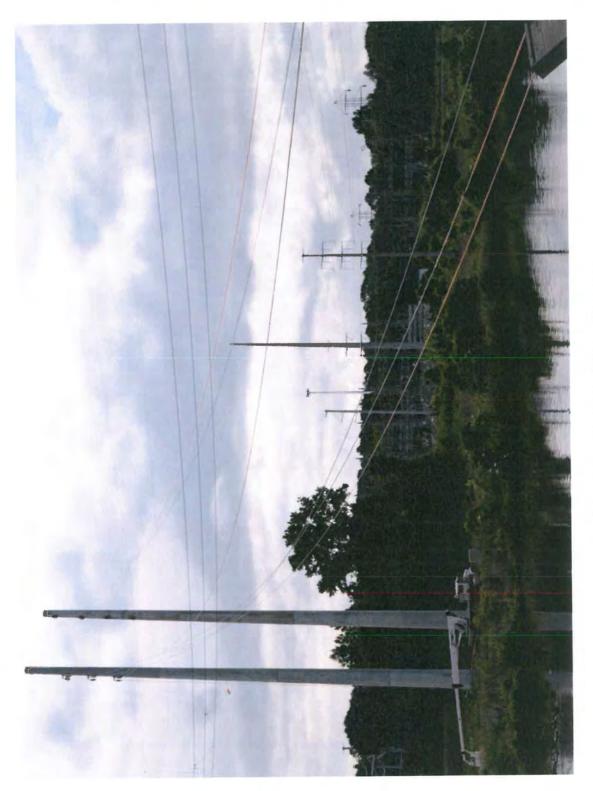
Three Rivers Greenway (N 34° 01' 16.71", W 81° 03' 48.49")
